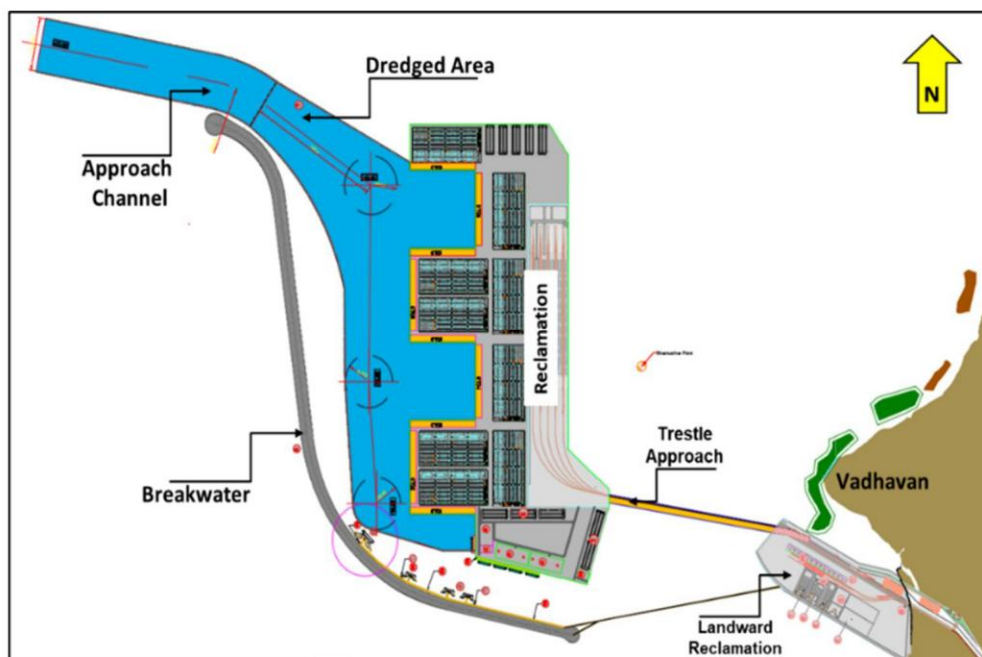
Finalised master plan layout of proposed port at Vadhavan
